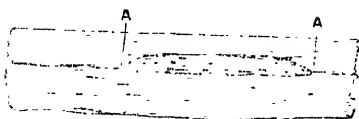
Piece broken out of Corner Edge of Shelf
